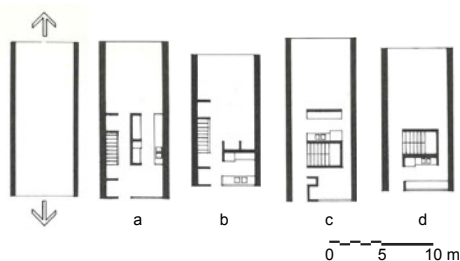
Double-orientation unit (open-ended); a) Interior stair and core, longitudinal stair; b) Exterior kitchen, longitudinal stair; c) Interior stair and core, transverse stair; d) Exterior kitchen, transverse stair
